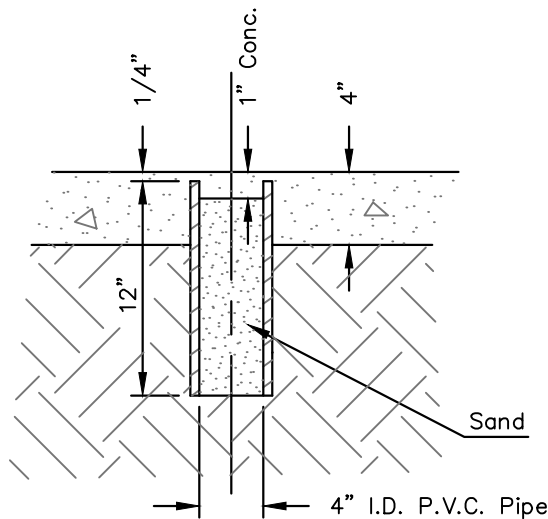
DETAIL OF SIDEWALK PARKING ONE SIDE ONLY
